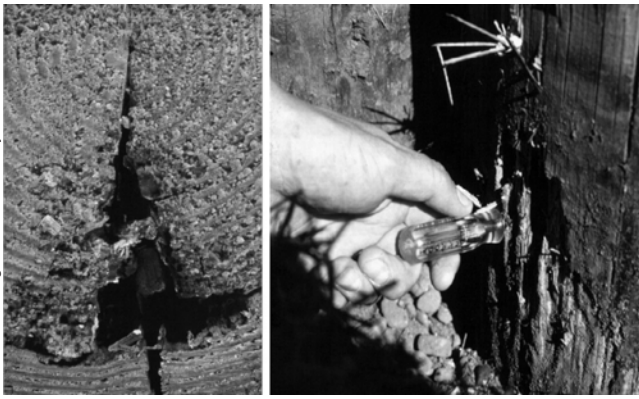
Damage due to internal decay (left) and external decay (right) on large timbers can be arrested by remedial treatment.
